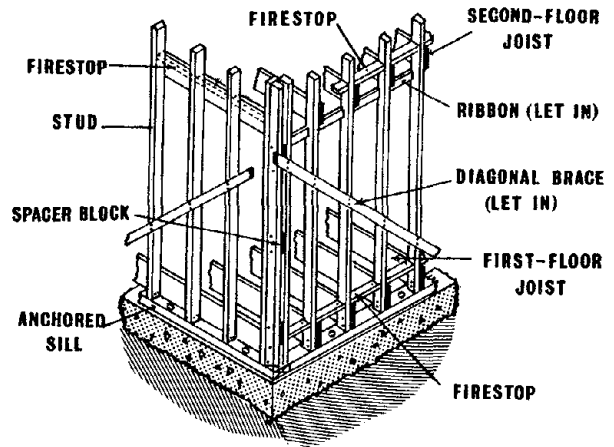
An Illustration of Firestops in Walls of Light-Frame Construction.
